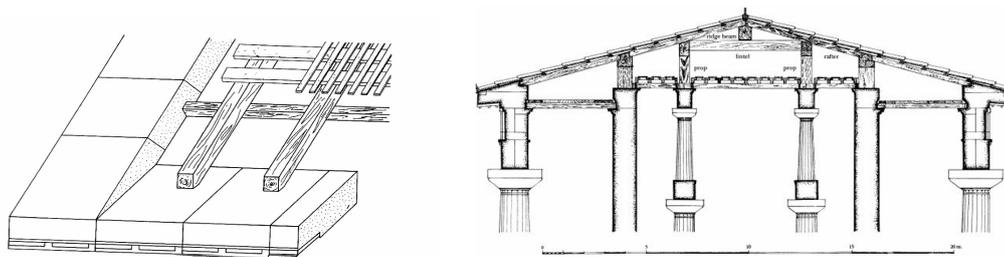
Greek roof framing (left) and post-and-lintel roof structure (right).
